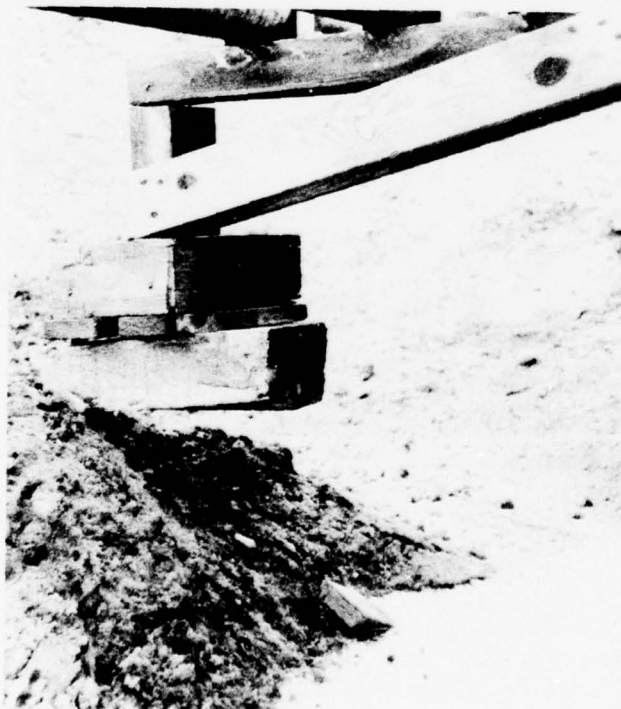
Loss of pipeline foundation support caused by ablation of ice beneath dirt.
